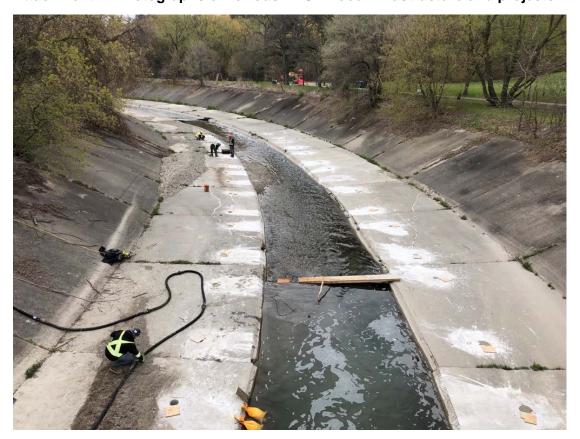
Yonge/York Mills Channel concrete repair in 2020.
